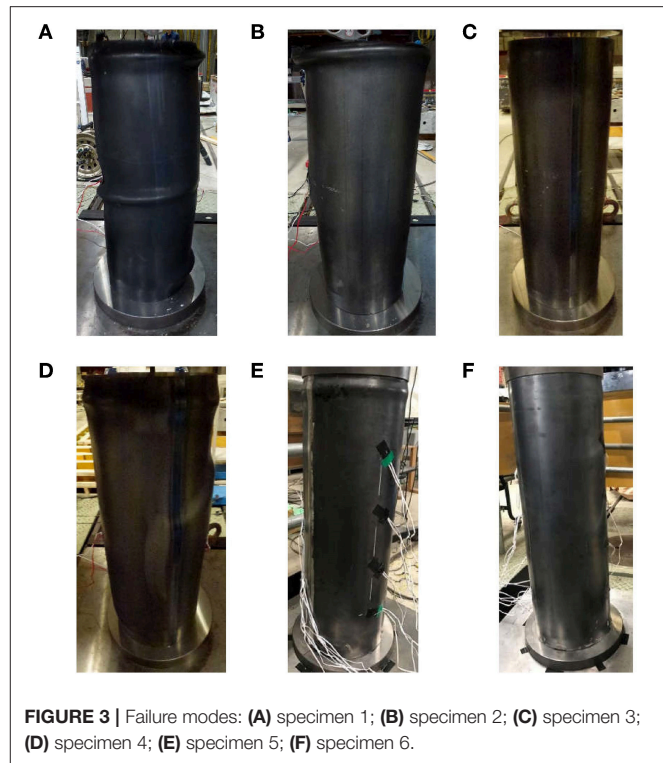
| Failure modes: (A) specimen 1; (B) specimen 2; (C) specimen 3; (D) specimen 4; (E) specimen 5; (F) specimen 6.
